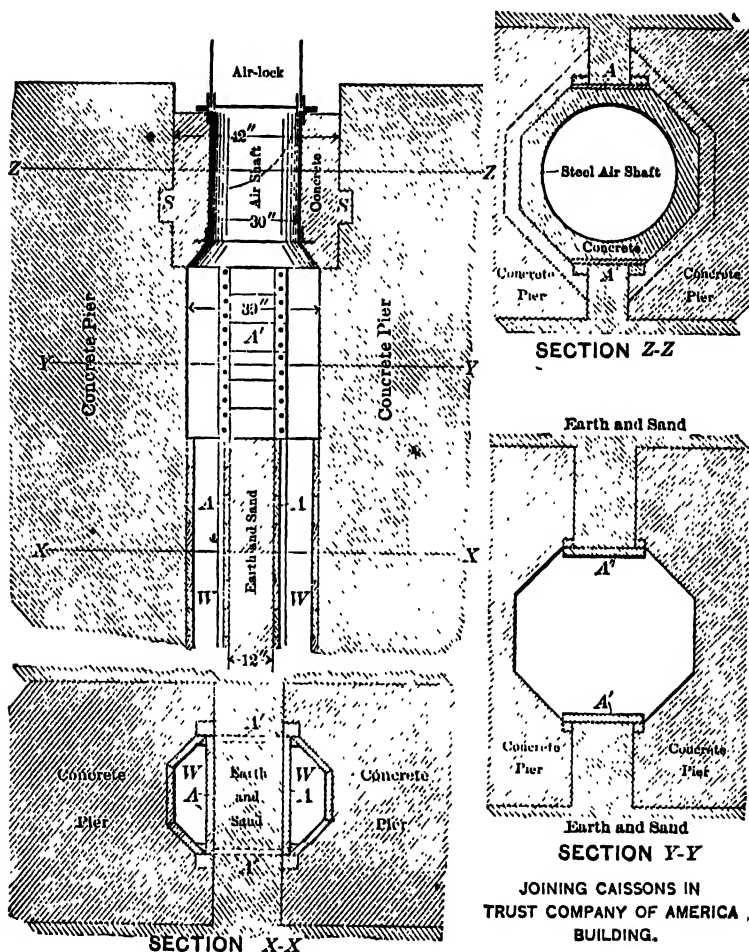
Method of Sinking Joint Well between Caissons.
